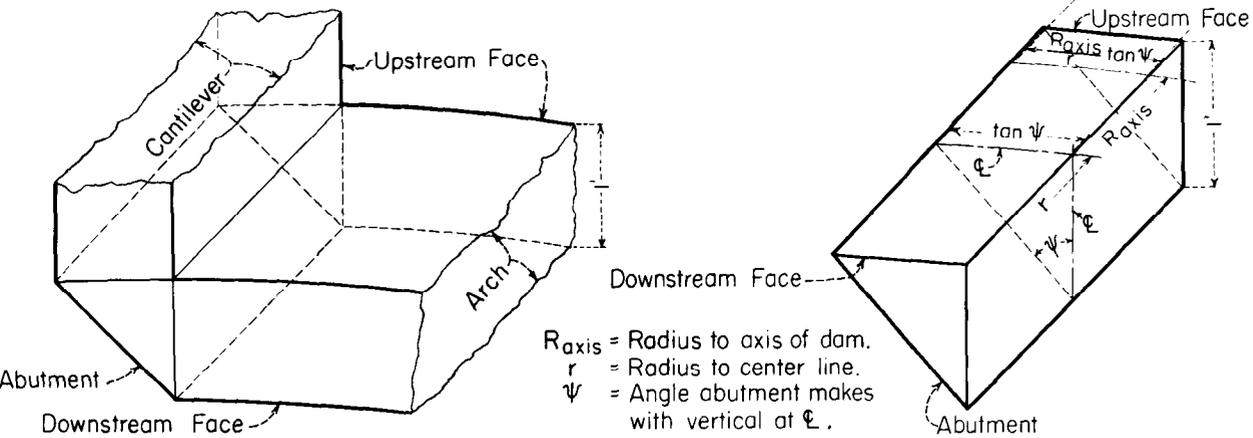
Contact of arch and cantilever with abutment.—288-D-434
